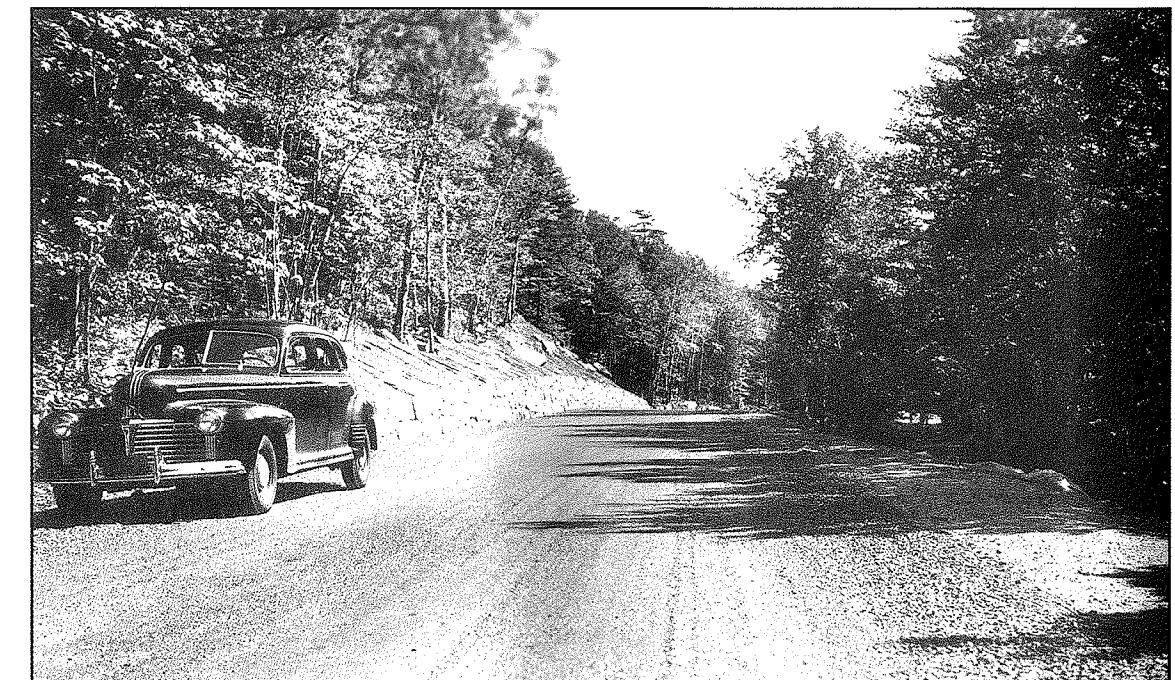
Day Mountain Road, construction station 77+00, after construction, 1941. Photograph from BPR, *Progress Views*.
